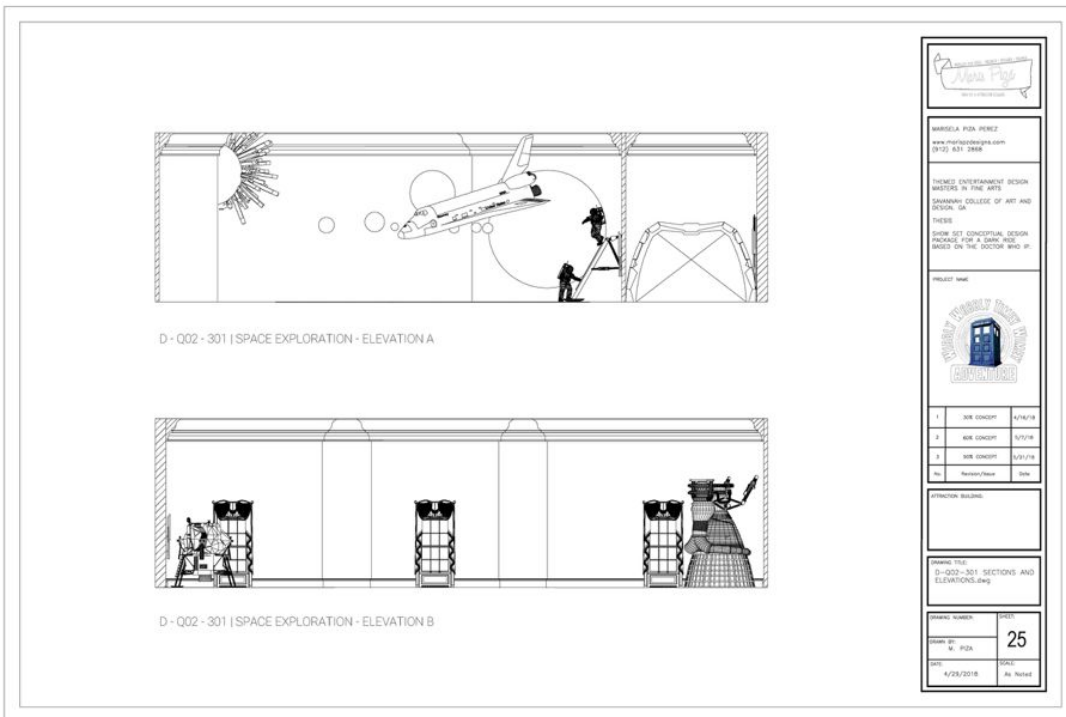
D-Q02-301 | Space Exploration - Sections and Elevation
